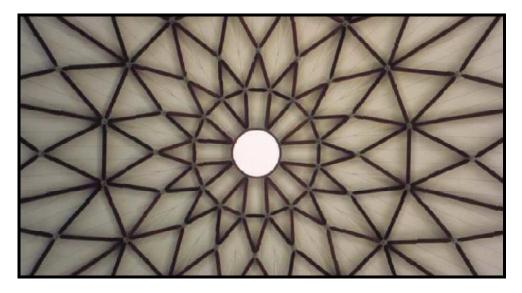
Roof structure of the Gurdwara Southall Temple (Timber Research and Development Association, document on-line).
